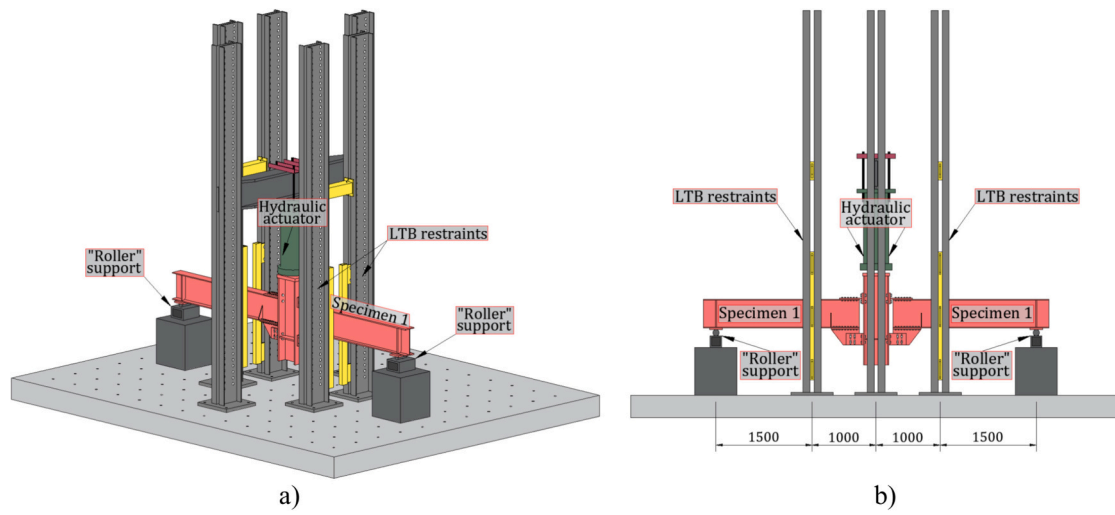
Test layout for Test 1: a) 3D view; b) Elevation.
